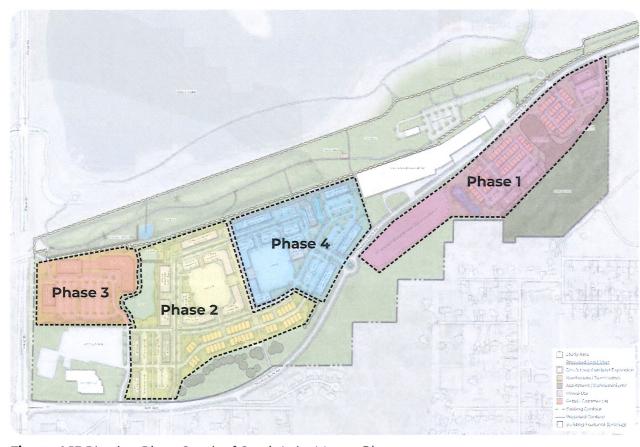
Phasing Plan - South of Gray's Lake Master Plan
